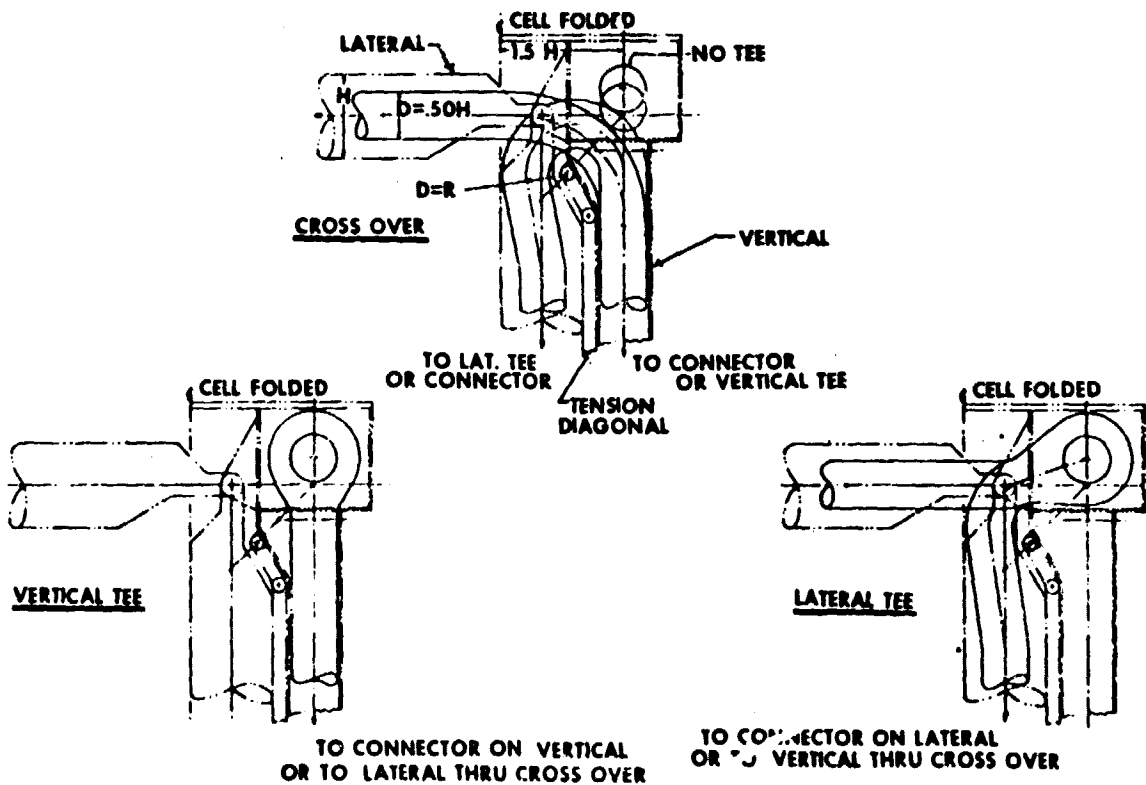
BOX TRUSS INTERNAL UTILITIES CROSS ROUTING
